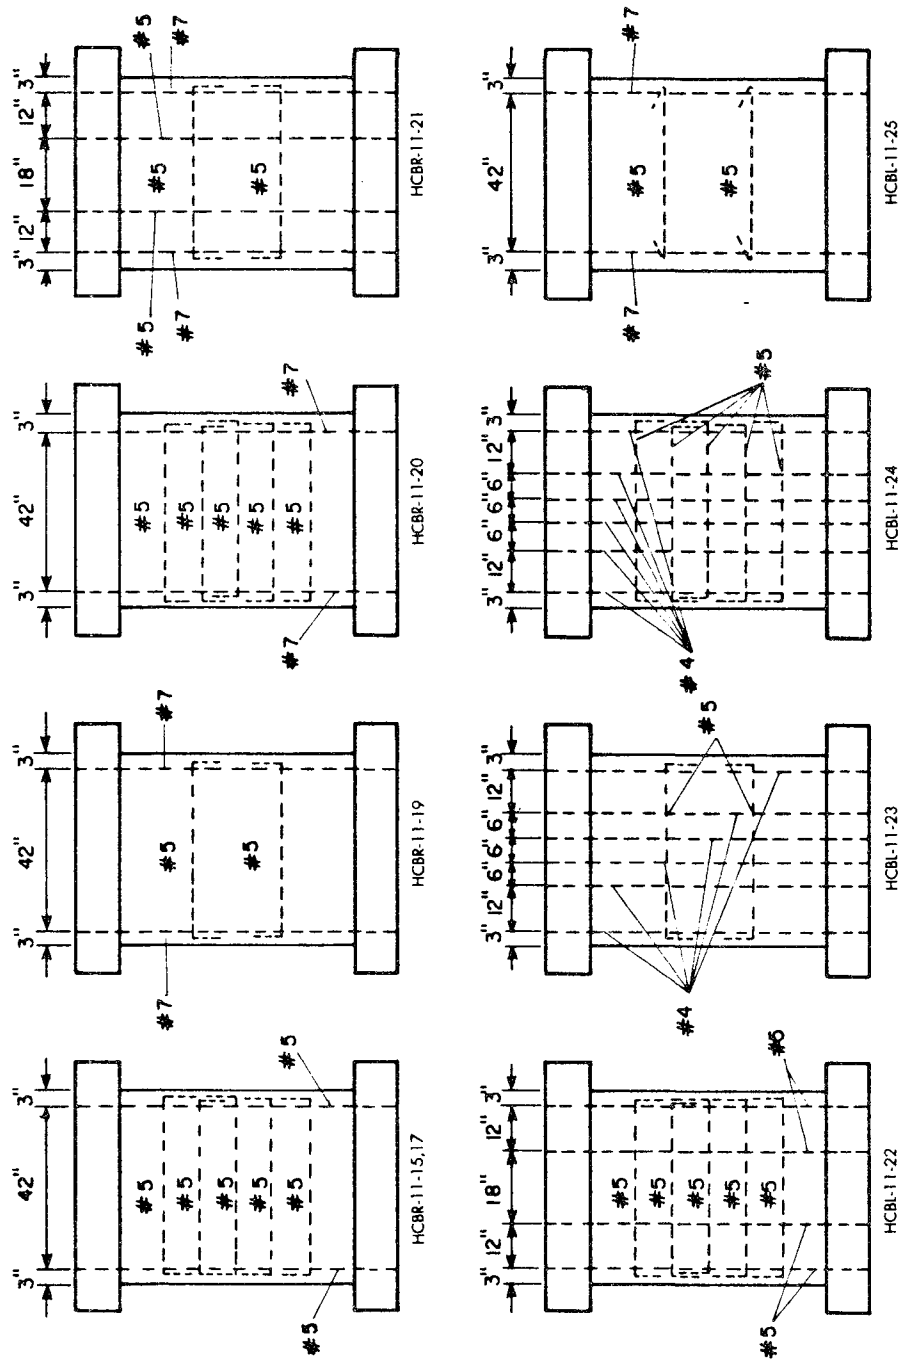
(b) REINFORCING STEEL ARRANGEMENTS FOR HOLLOW CLAY BRICK PIERS (HCBR)
